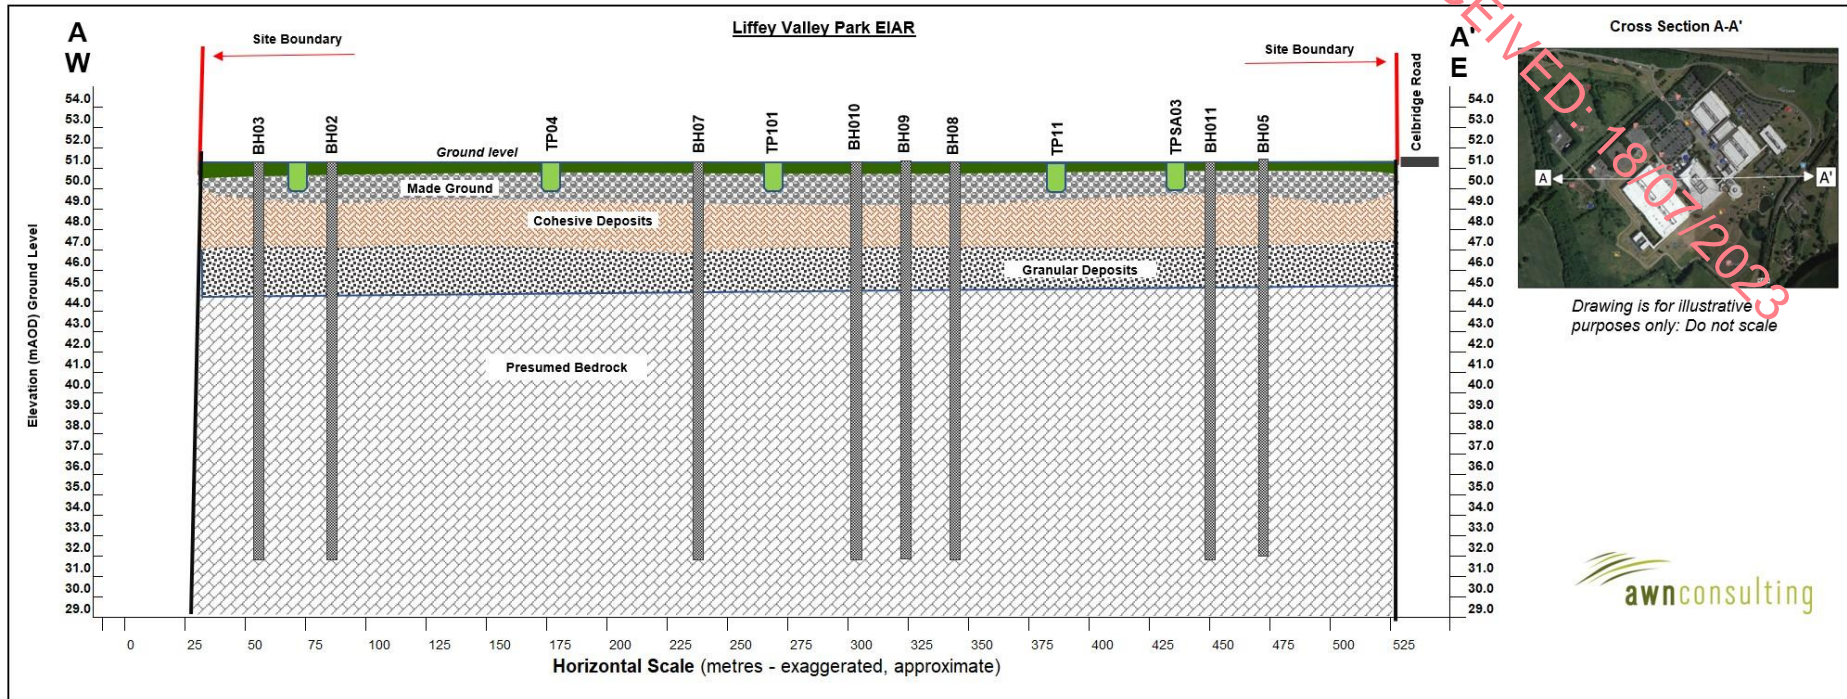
Site Conceptual Model, local cross section of the Site (A-A' northwest to southeast)
